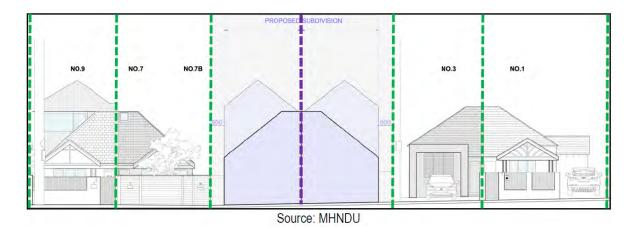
Council Envelope in Streetscape (Existing Lot Boundaries in Green) (Source: applicant's submission)
